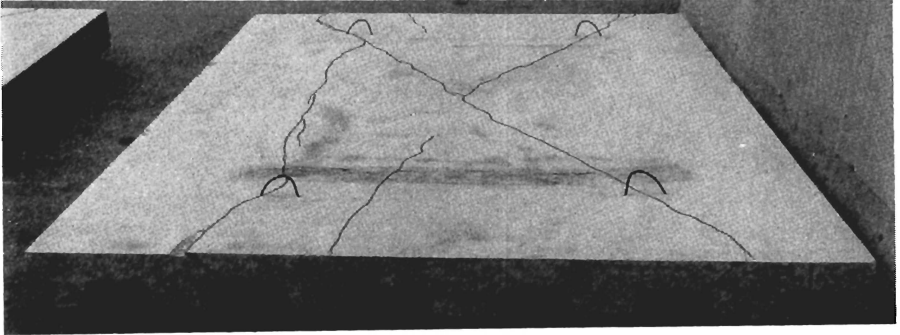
Crack Pattern of Single Span Specimen R-1-SS
